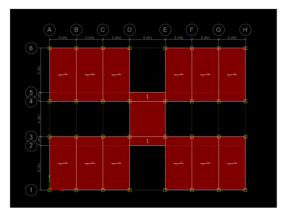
Plan of G+15 story CFST building (22 m x 16 m)
